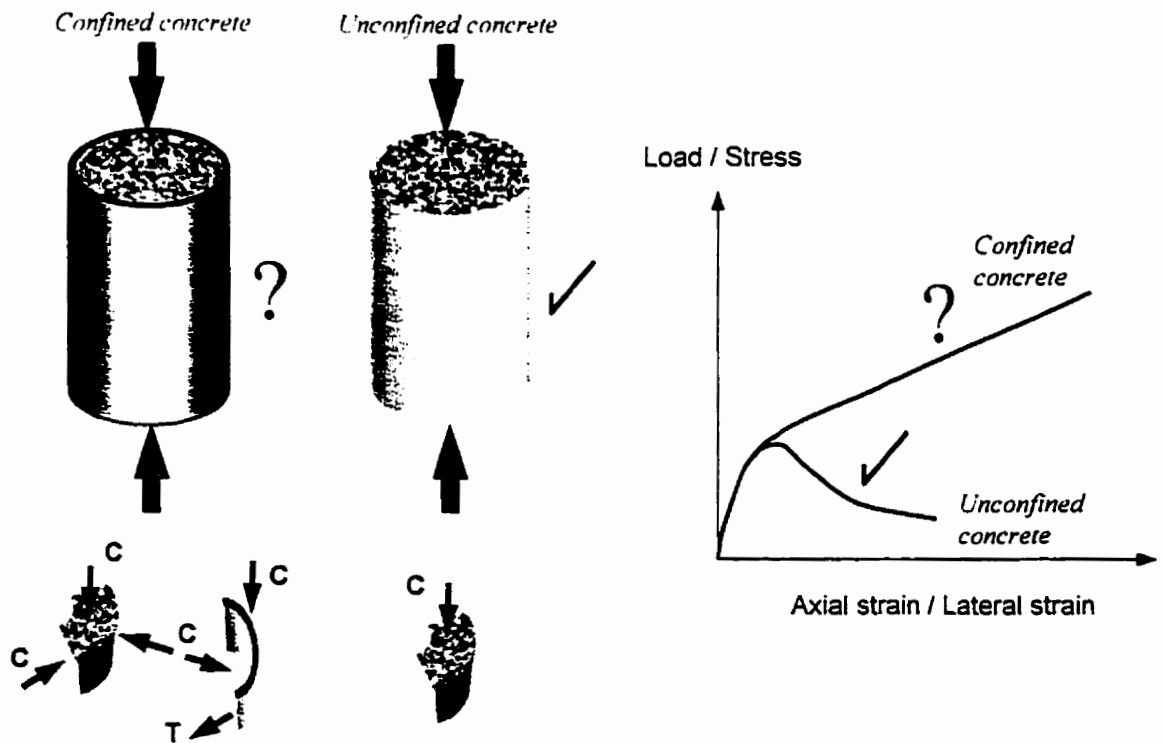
Concrete-filled FRP tubes as axial compression members
